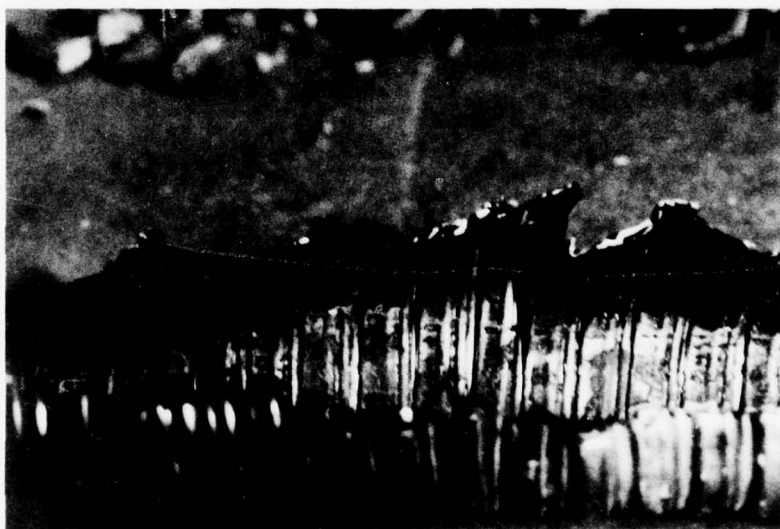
Bottom half of conduit in beam 11. Note border areas on both sides of 1-in.-wide strip of rust
